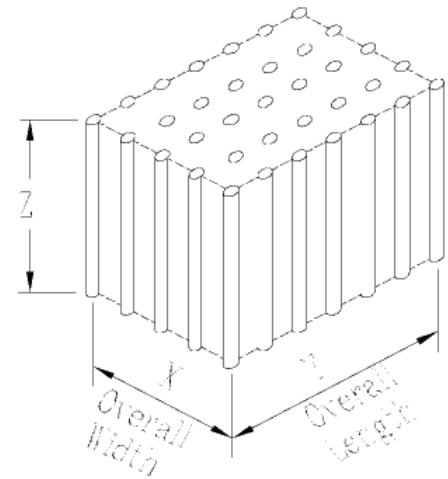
Pile Group Acting as a Block Foundation
